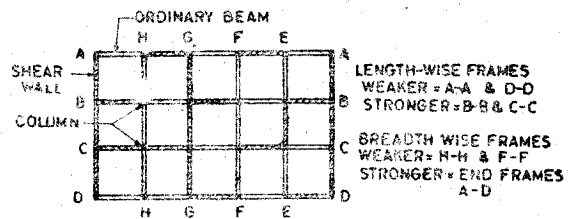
A Typical Floor Plan Showing Weaker & Stronger Frames in Both Directions.
